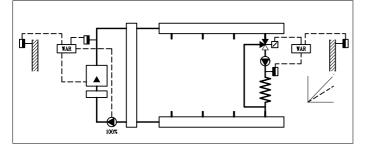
L.L.H. with boiler pump with a single boiler installation
